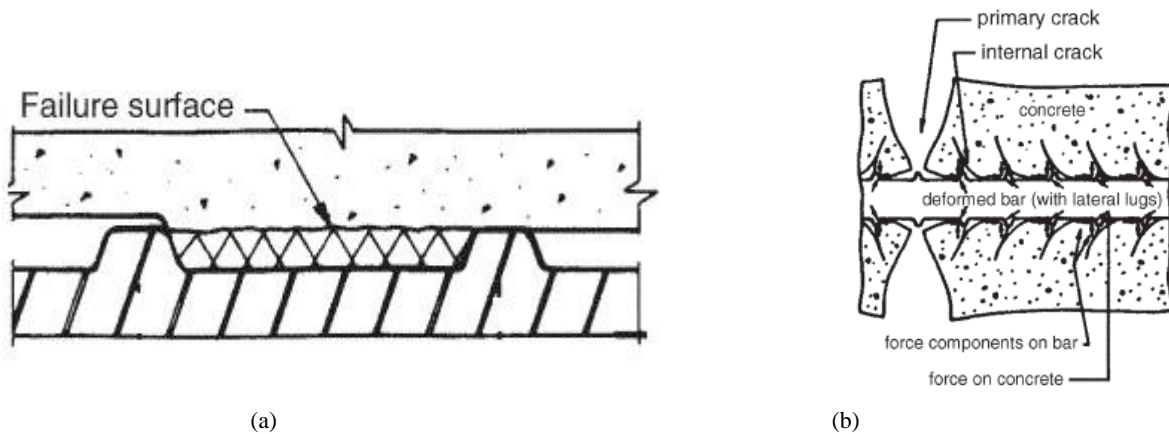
Failures Modes; (a) pullout failure and (b) splitting failure (ACI-ASCE, 2012)
